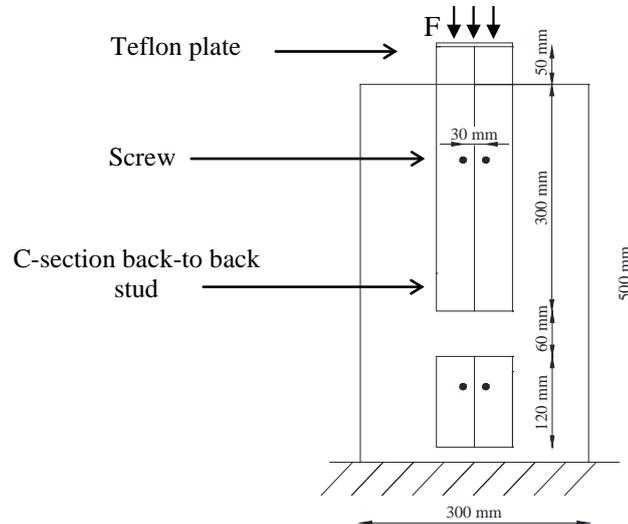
Schematic view of the tested specimen dimensions (in mm)
